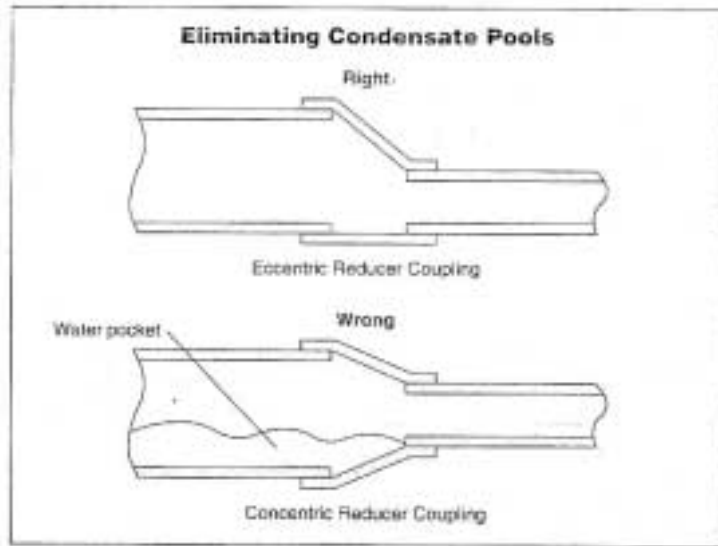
An eccentric reducer precludes the forming of a condensate pool that can form behind a concentric reducer.
